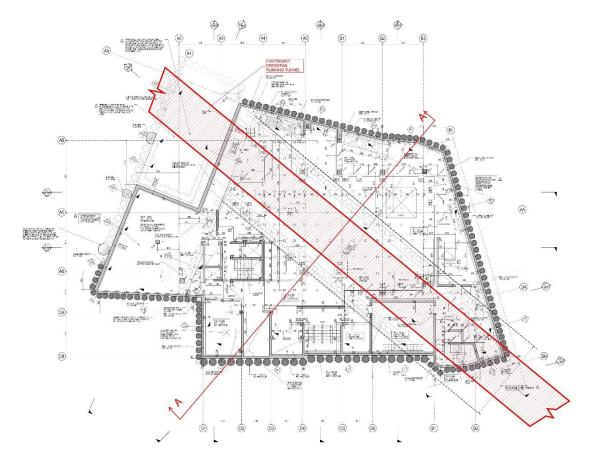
Plan of Modelling Sections through Crossrail.
